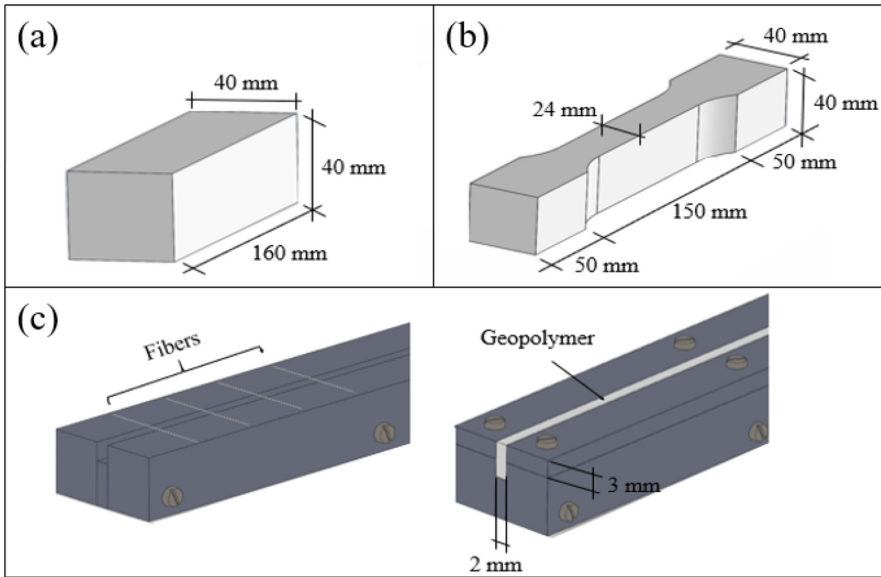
Shapes and dimensions of (a) Prismatic specimen, (b) dumbbell-shaped specimen, and (c) mold and production of pullout specimens.
